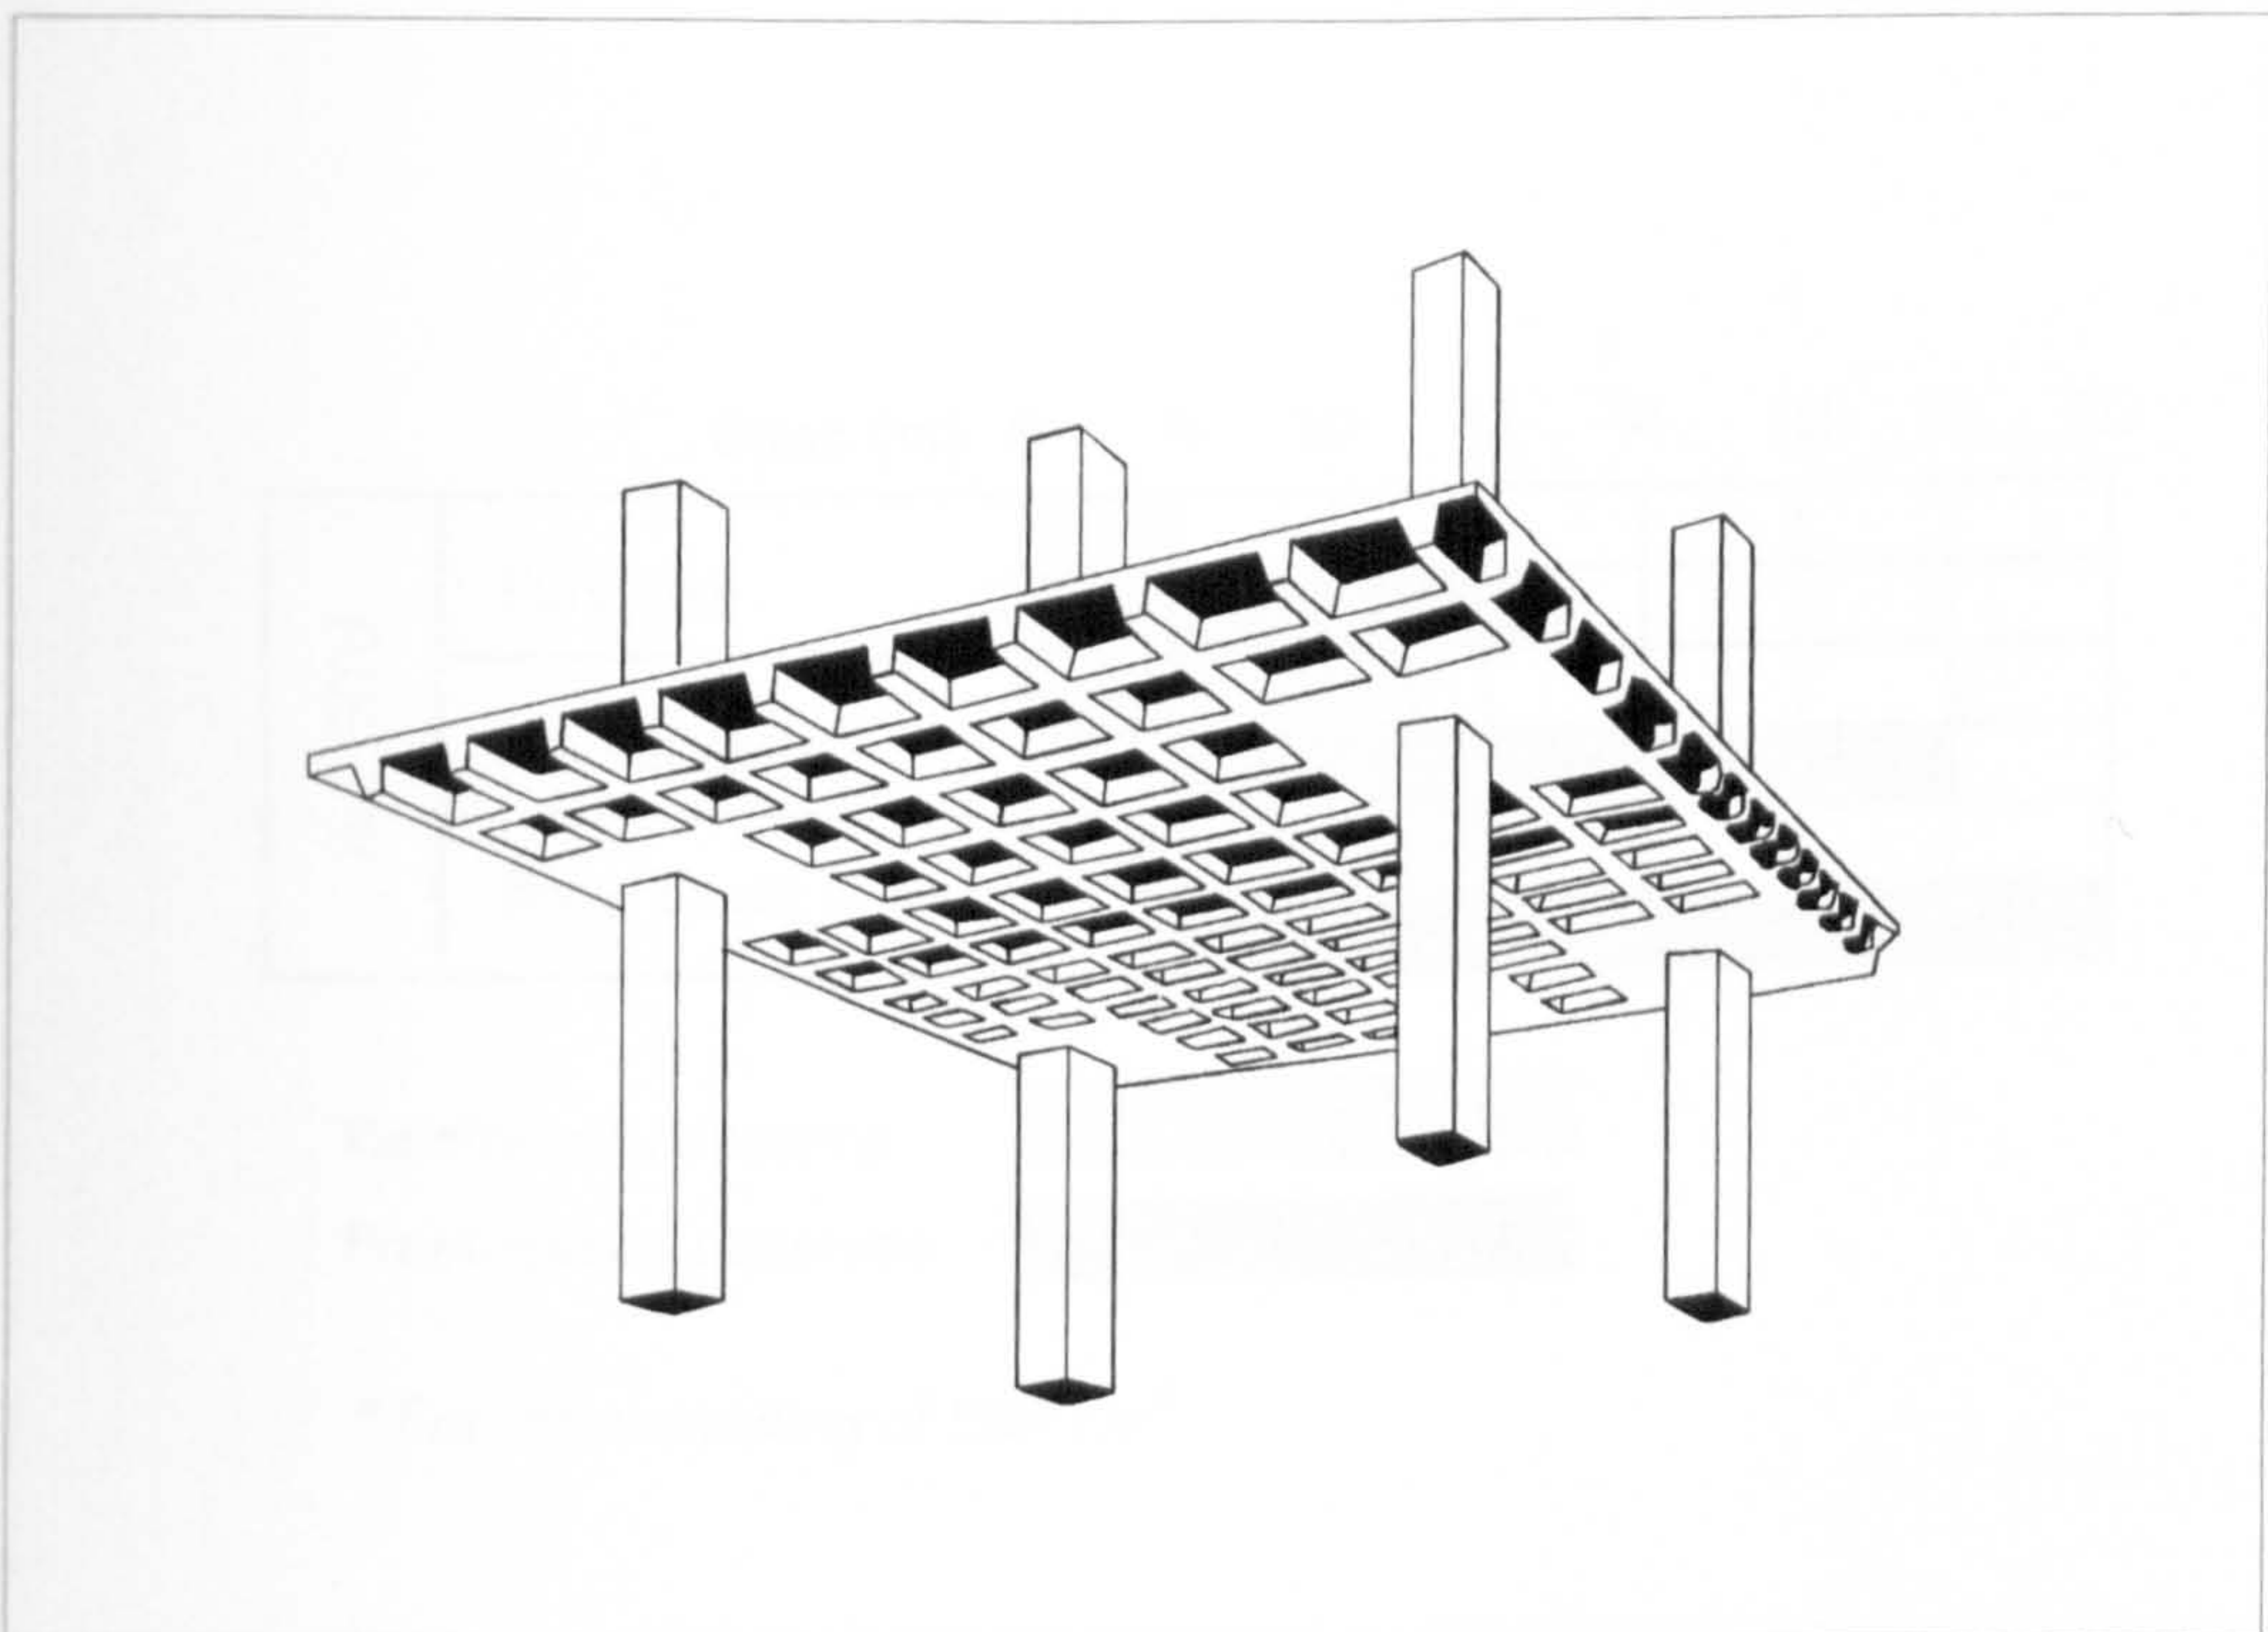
Coffered (or waffle) flat slab construction (after Stevenson, 1994).
